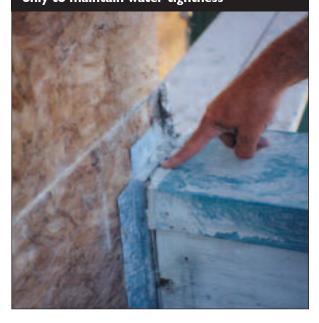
Crack at cladding transition between brick veneer and stucco
